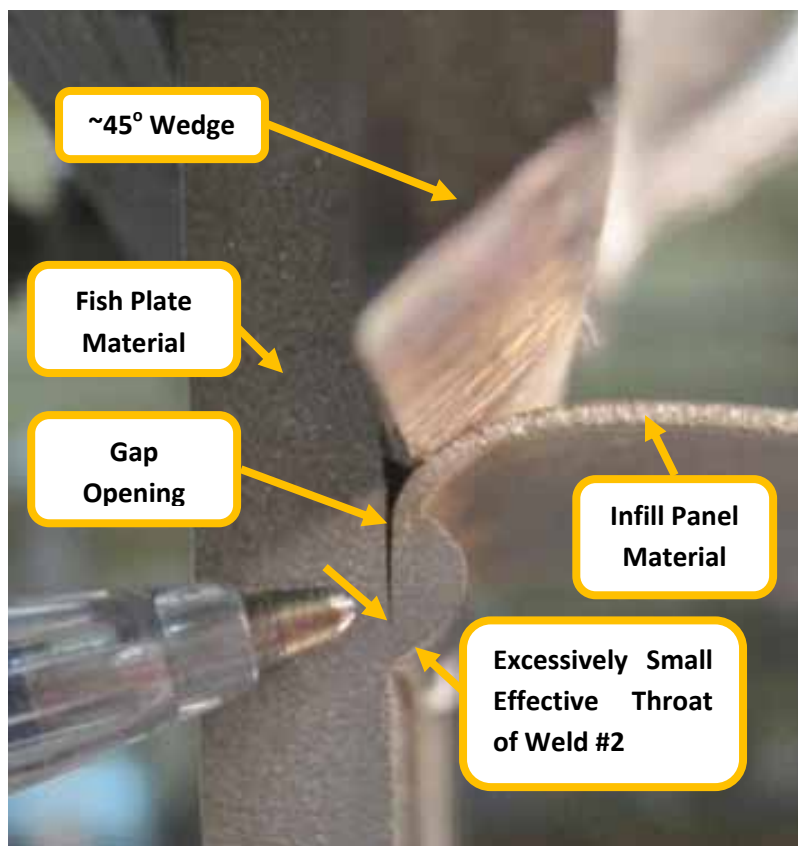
Cyclic Weld Test Configuration T3-C2; Weld #3 (Both Sides), Without Chill Strip
